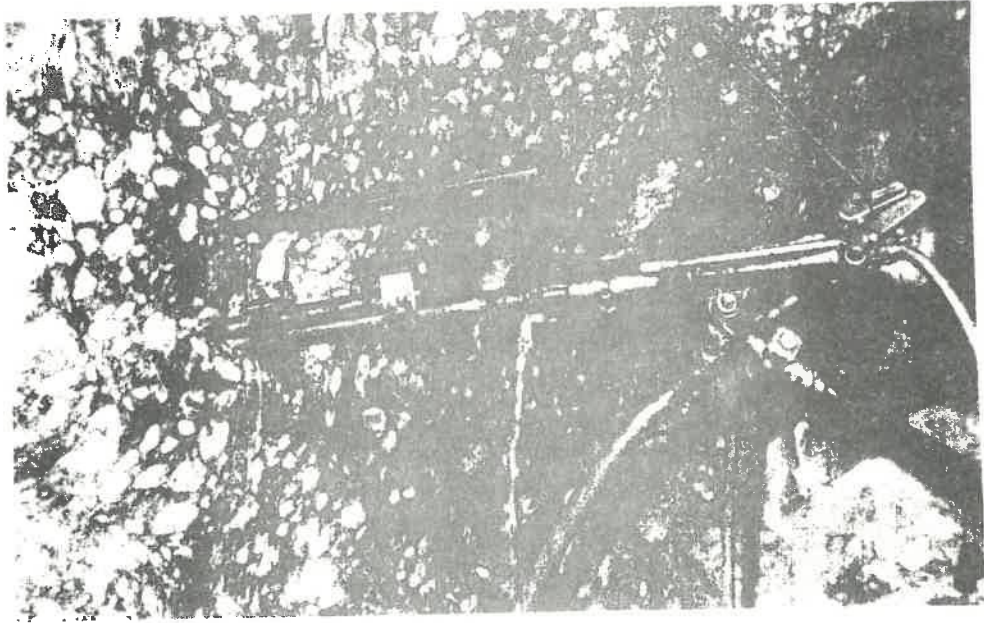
THE CLAMPING DEVICE FOR INTERLINKING THE BORES OF TWO HOLES DRILLED IN PARALLEL
